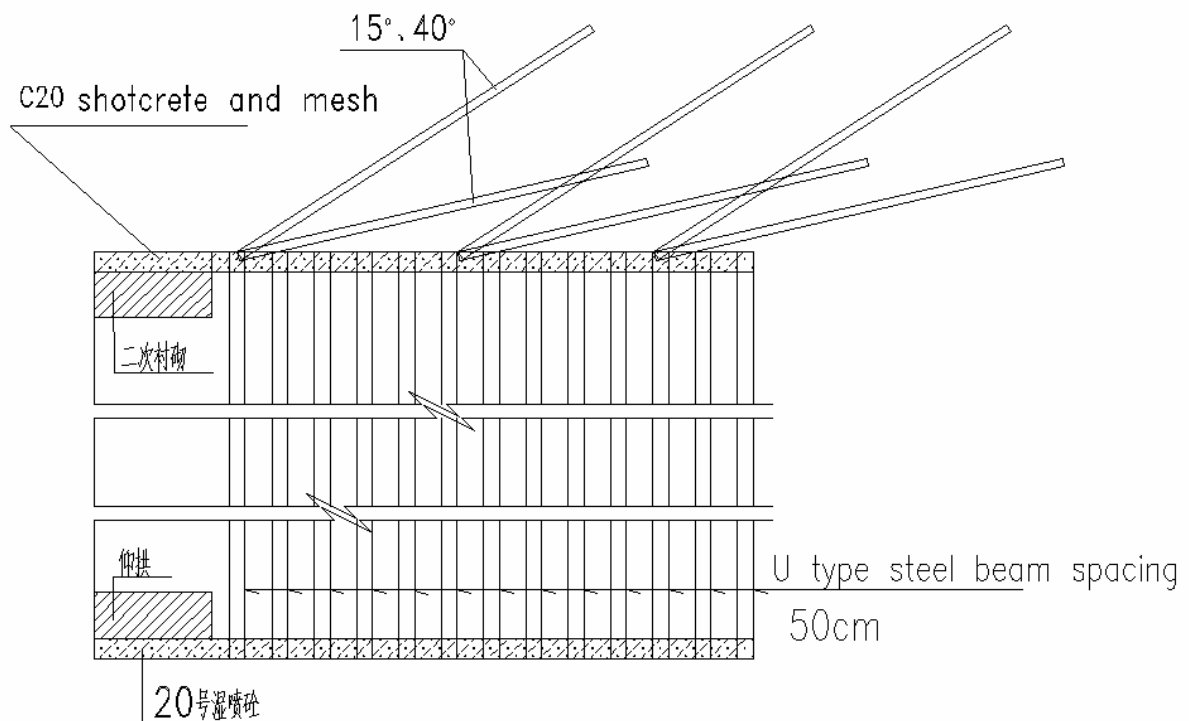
Detailed longitudinal cross section of the forepoling umbrella.
